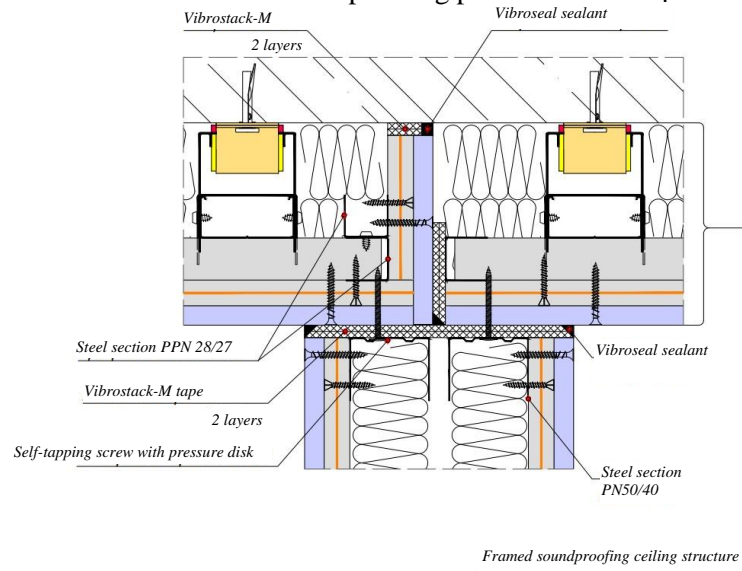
Connection of double-frame soundproofing partition to framed soundproofing ceiling.
